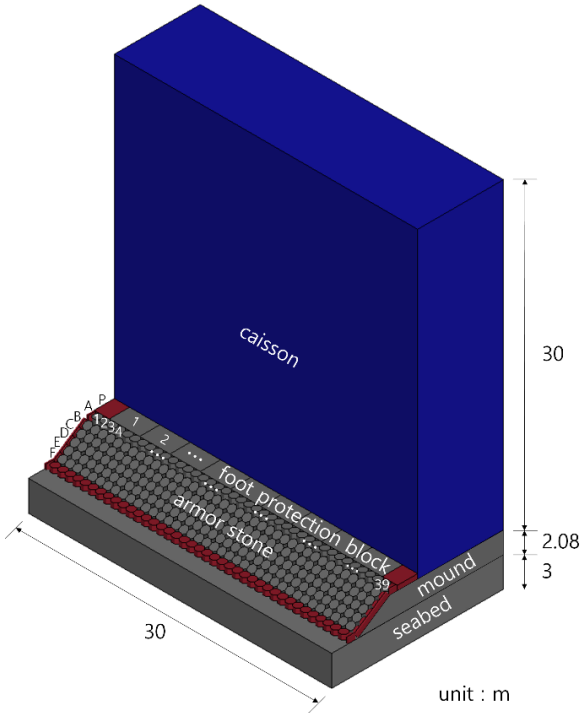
Schematic of a quay wall with caissons, foot-protection blocks, and armor stones
